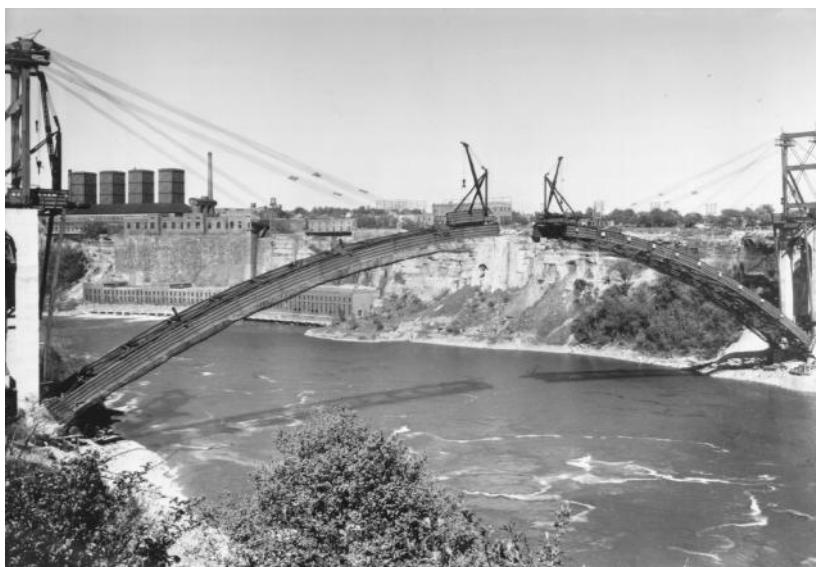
Erection of arch ribs, Rainbow Bridge, Niagara Falls, New York, 1941. Bridge span is 950 ft. (290 m), with rise of 150 ft. (46 m); box ribs are 3×12 ft. (0.91×3.66 m). Tiebacks were attached starting at the end of the third tier and jumped forward as erection progressed (see Figure 1.3). Much permanent steelwork was used in tieback bents. Derricks on approaches load steelwork onto material cars that travel up arch ribs. Travelers are shown erecting last full-length arch-rib sections, leaving only the short, closing crown sections to be erected. Canada is at right, the United States at left. (Courtesy of Bethlehem Steel Corporation.)
